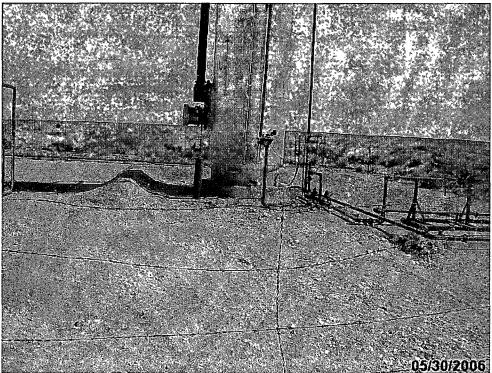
Looking southeasterly across excavation area one (1).
